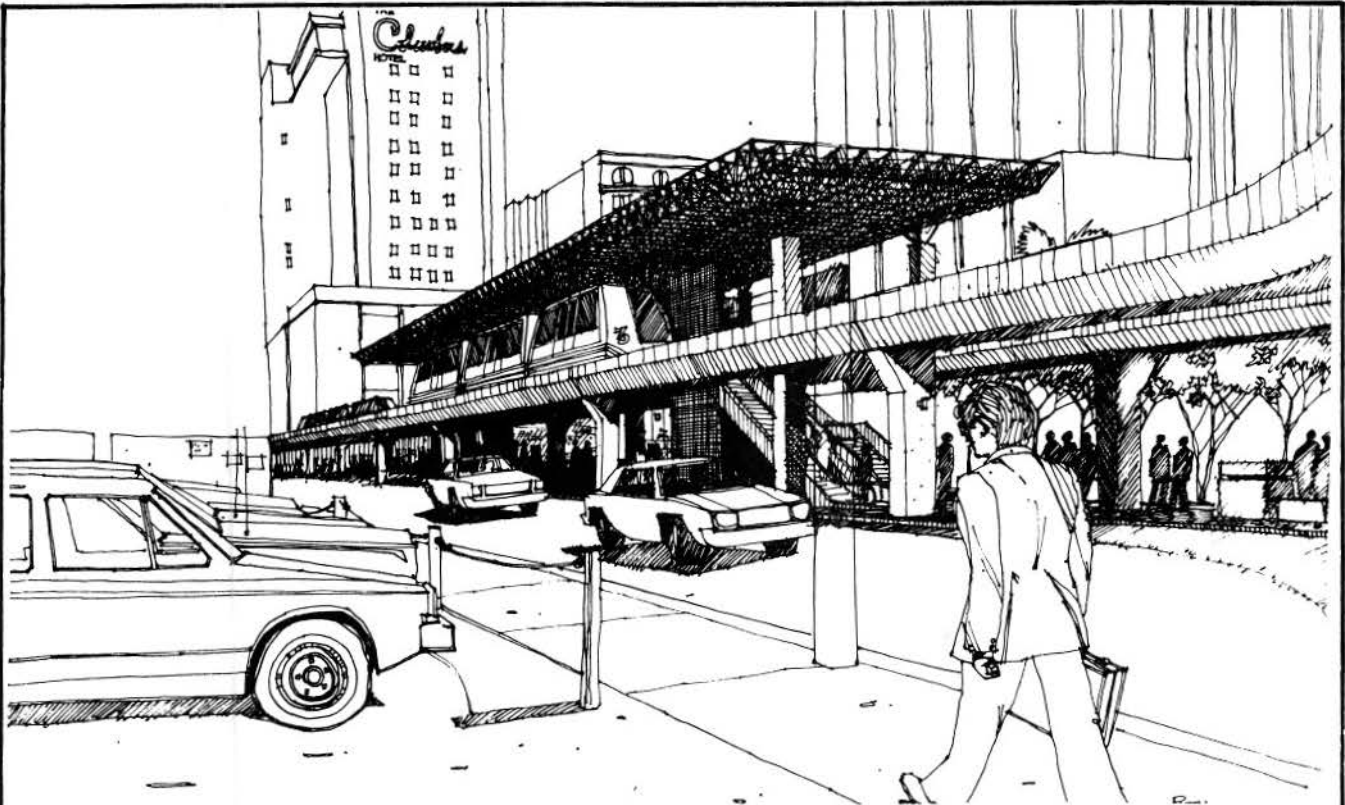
ARTIST'S SKETCH STATION 'P' LOOKING EAST
